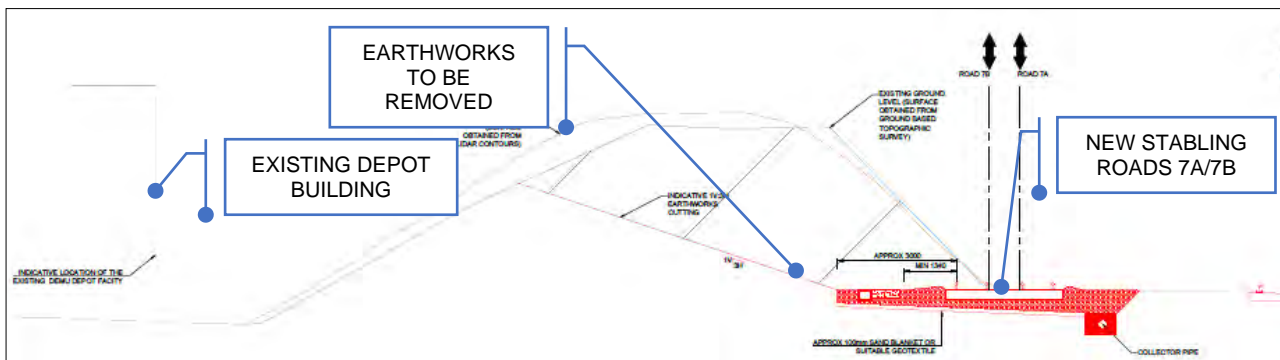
Section of proposed new stabling roads 7A and 7B looking south east
